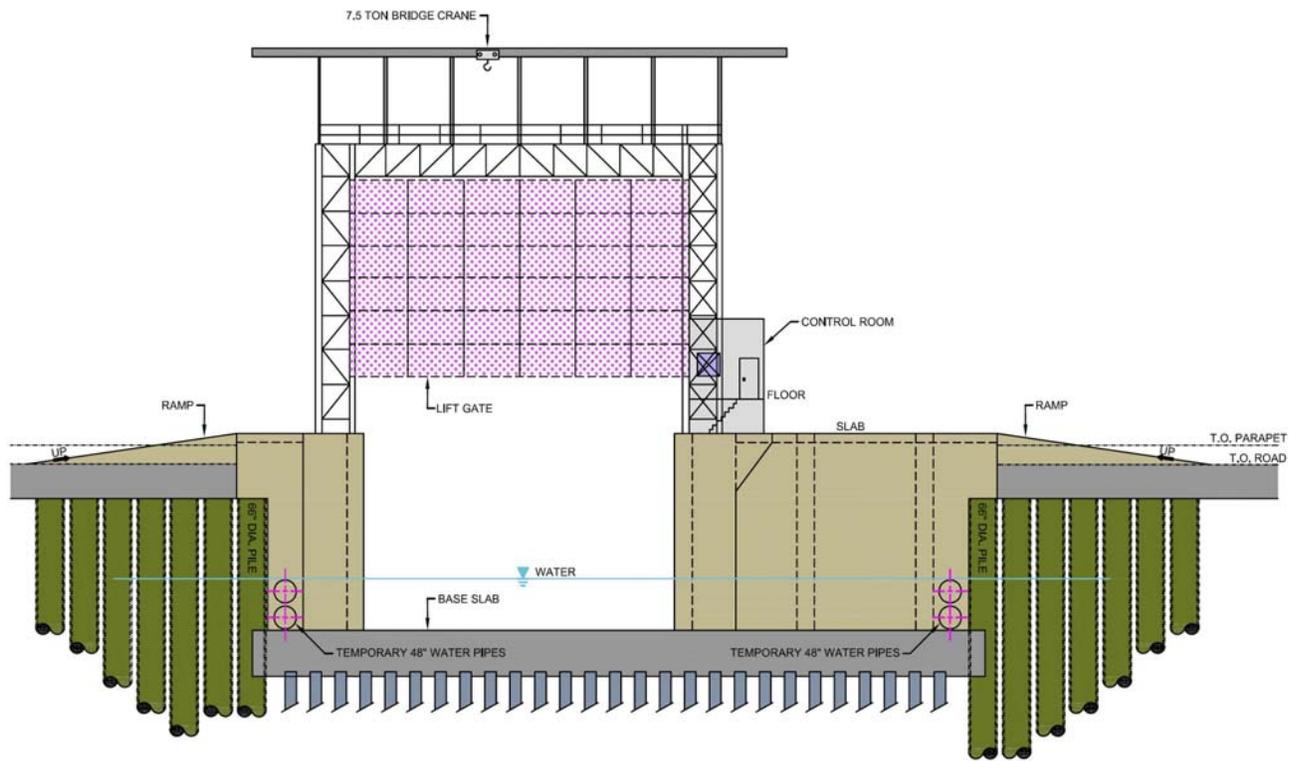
Conceptual plan for Bayou Bienvenue vertical lift gate in open position
